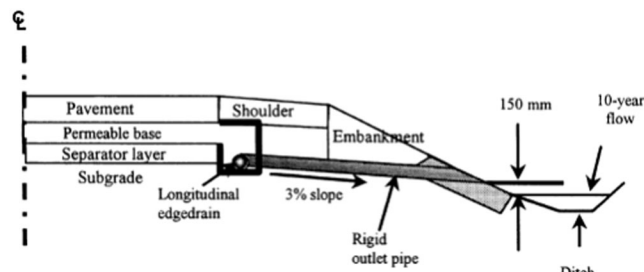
Typical drainage systems of modern pavements (with longitudinal edge-drain and outlet pipe) (12).
